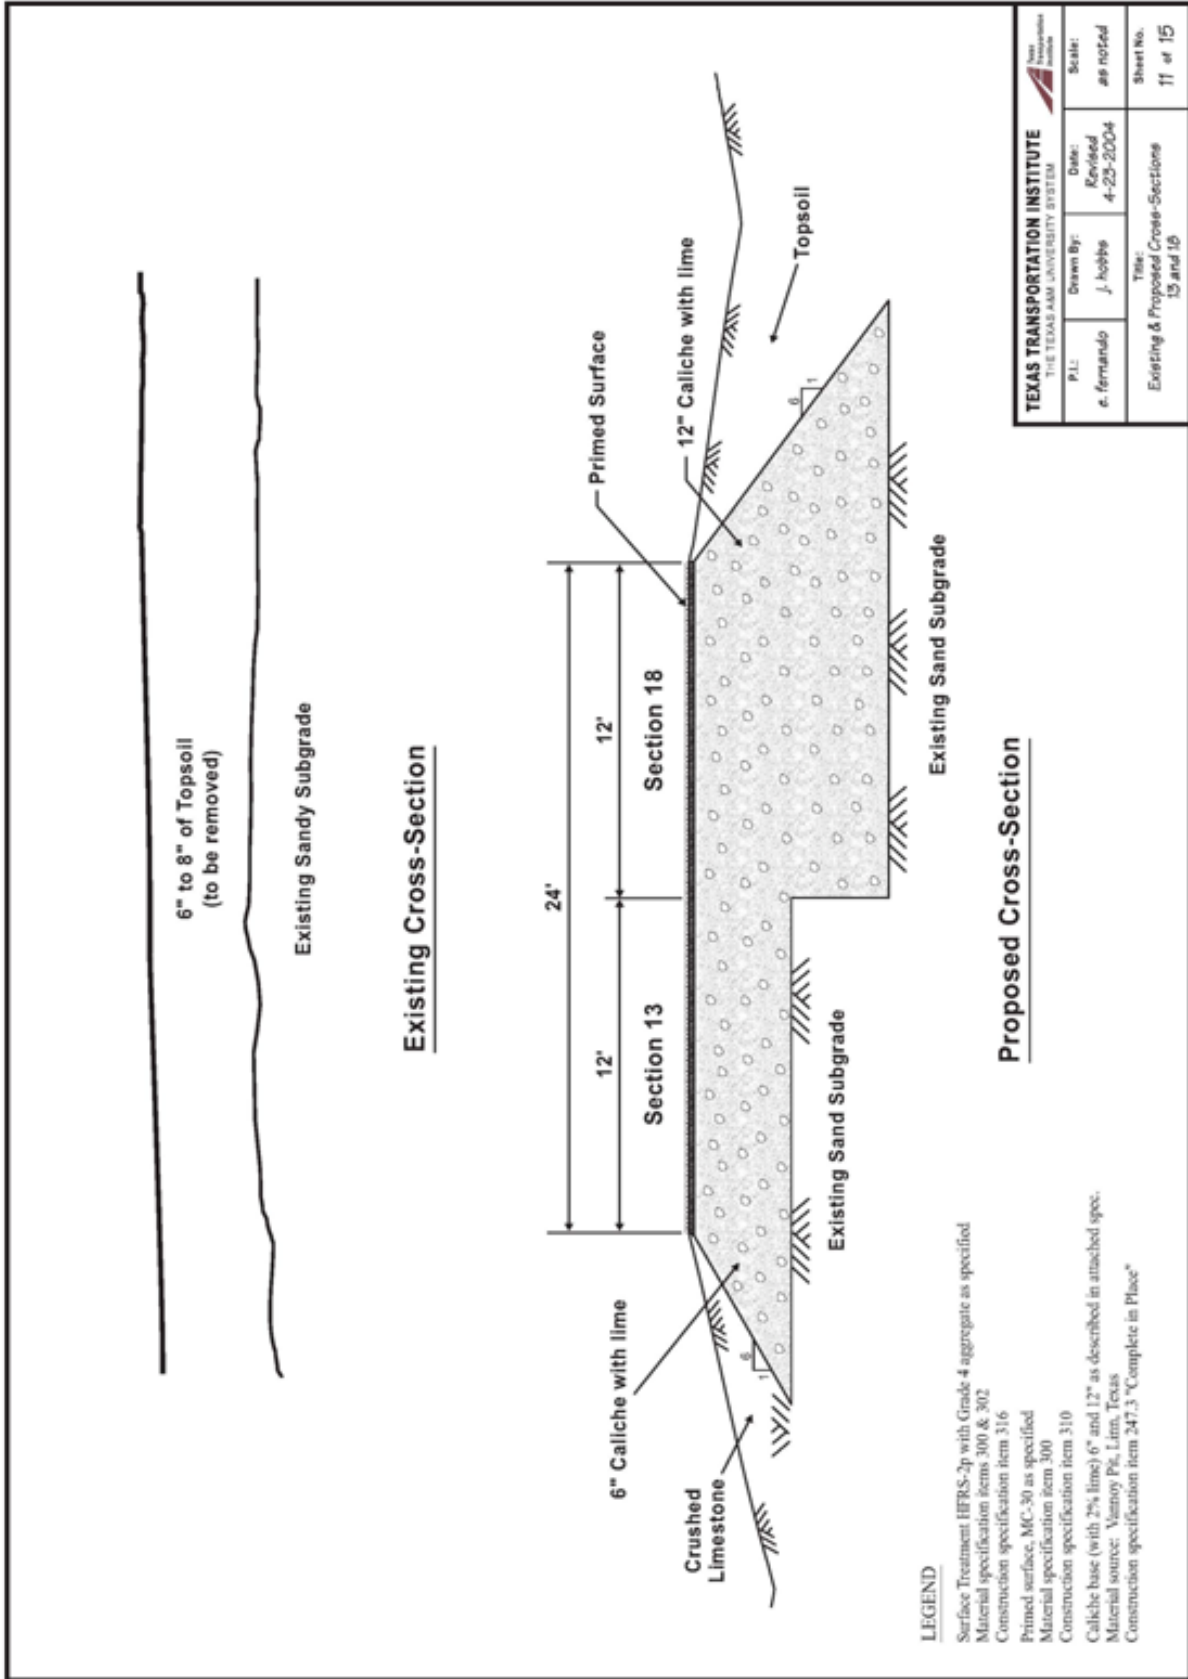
Existing and Proposed Cross-Sections for Sections 13 and 18.
